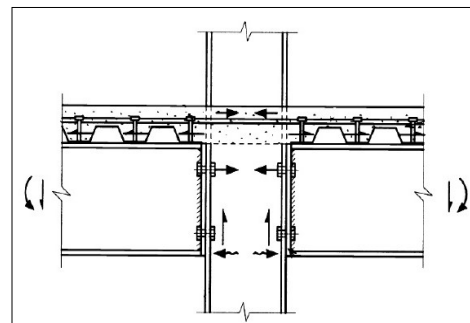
Force transfer in composite steel – concrete beam – to – column connection
